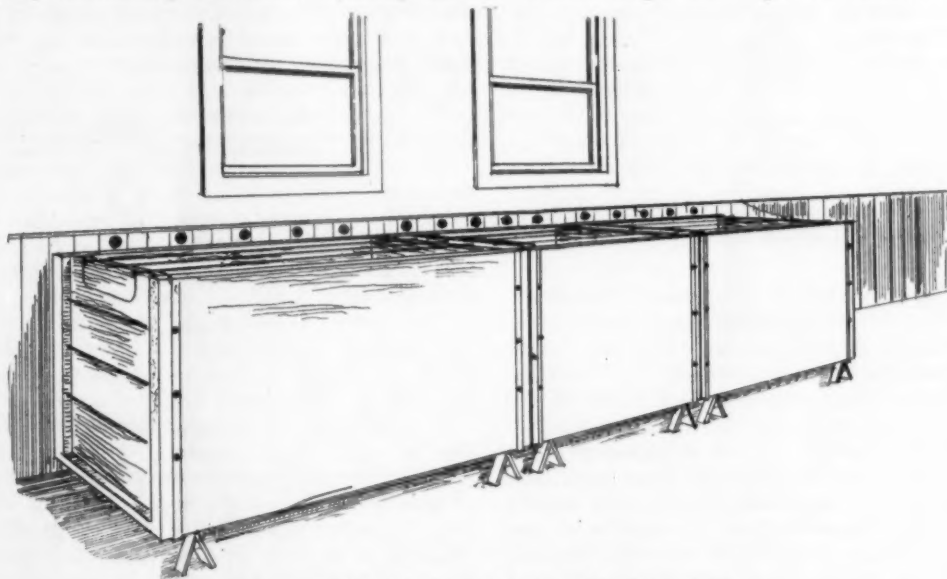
SHOWING PINE BOARD SUCTION PIPE.
